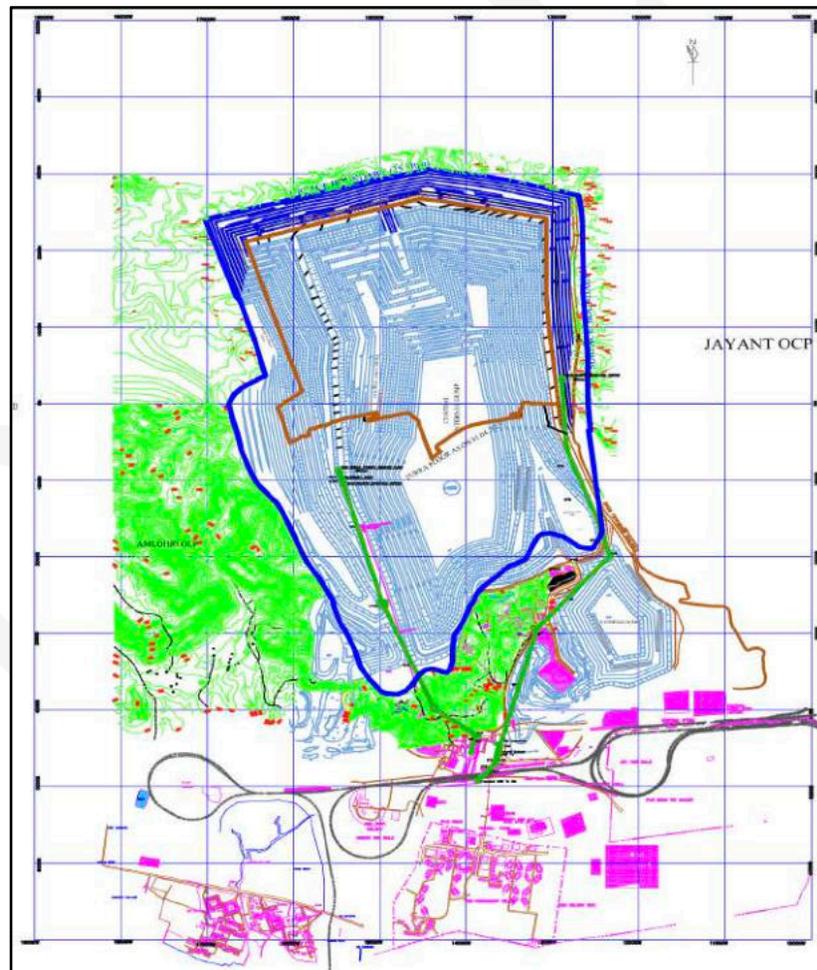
Final Stage dump plan of Nigahi OCP (Ref: Approved mining plan of Nigahi OCP)
